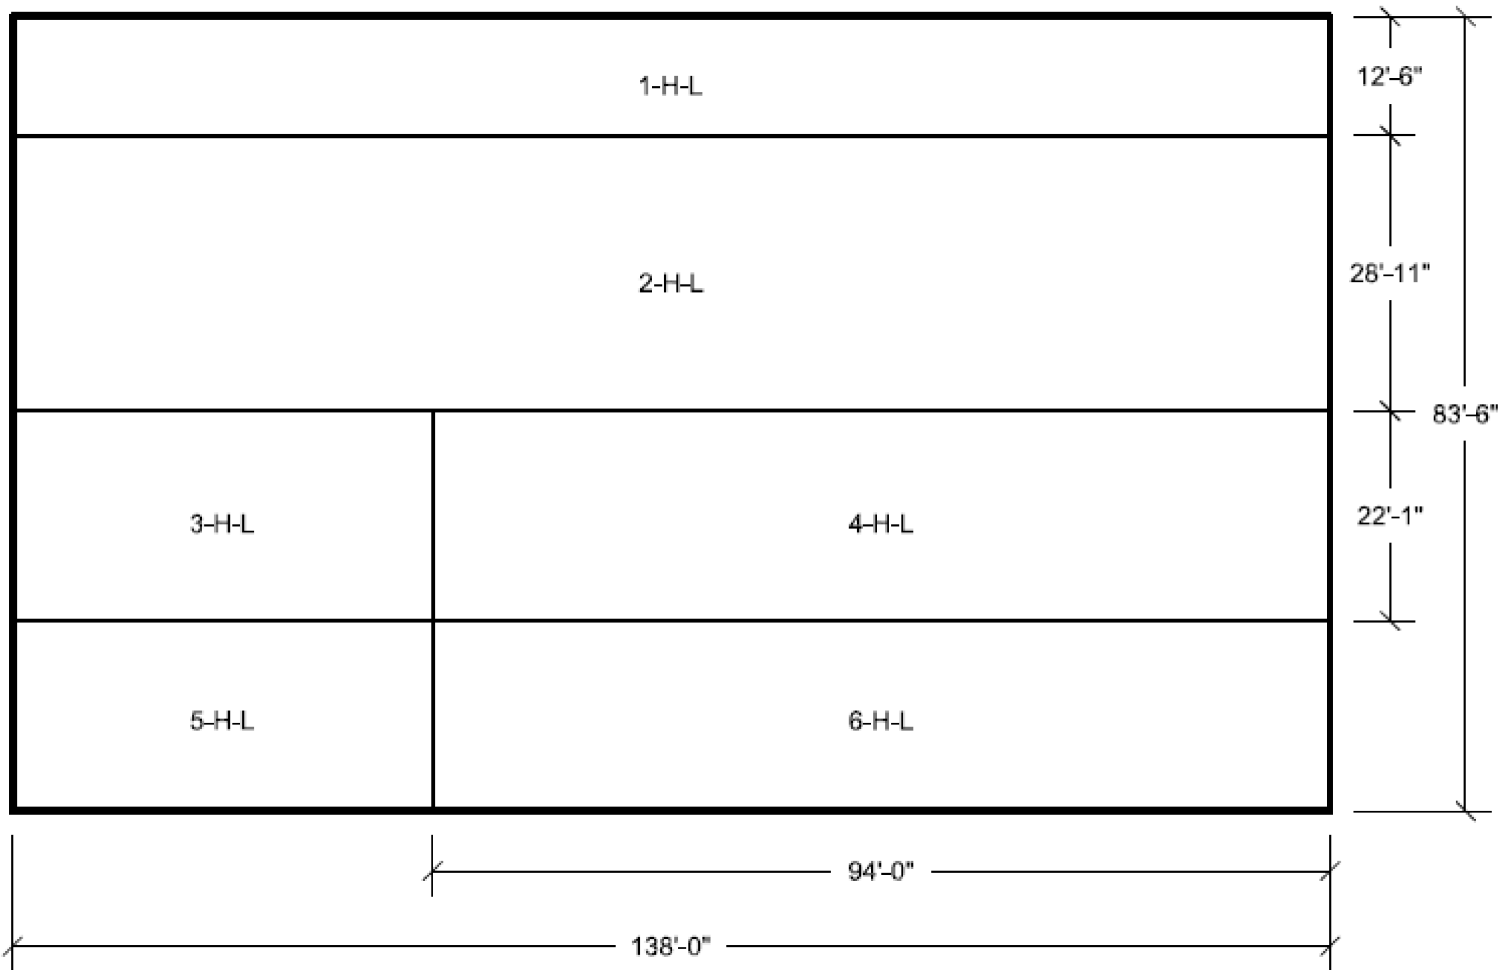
H.6-97 UHS Basin West Wall Looking East Horizontal Reinforcement Zones Near Side Face
